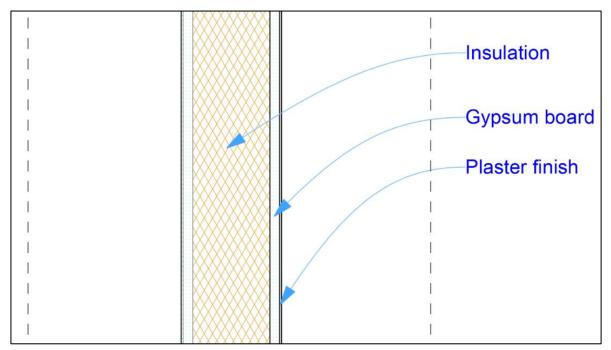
Layer details of the internal non-load-bearing wall (D-02). Source: (By Author)
